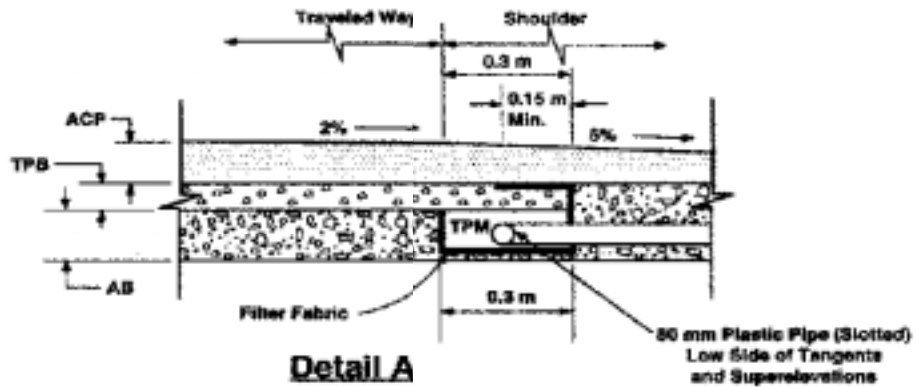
Typical cross section of flexible pavement with ATPB layer.(1)
